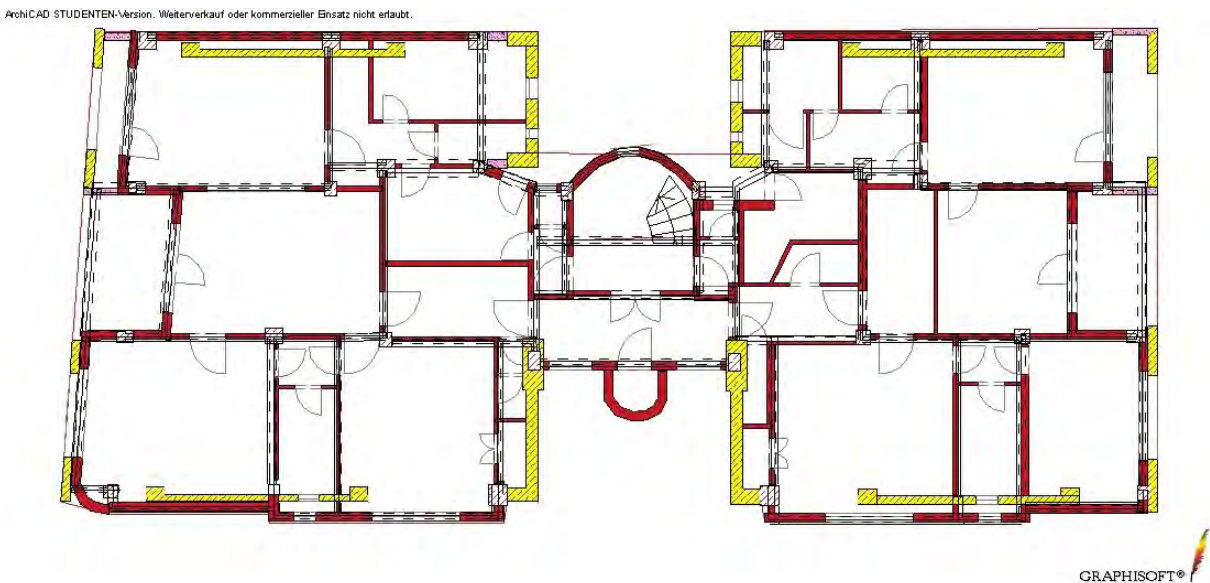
Retrofit plan for the typical building considered, using shear walls and column jacketing. The retrofit elements are highlighted. (from Bostenaru, 2004)
